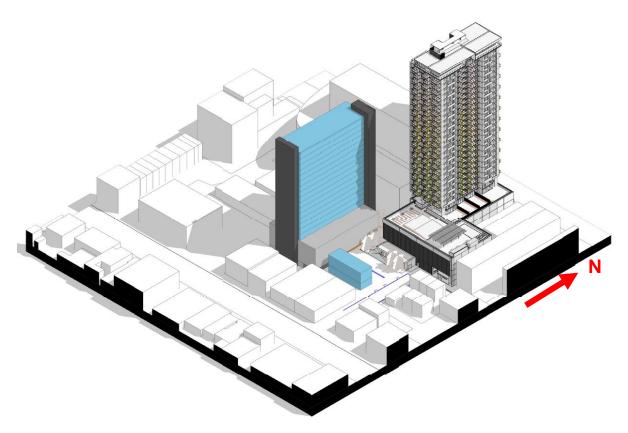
Southeast view illustrating the surrounding buildings of the proposed development site at Penny Place Adelaide – Stage 2.
